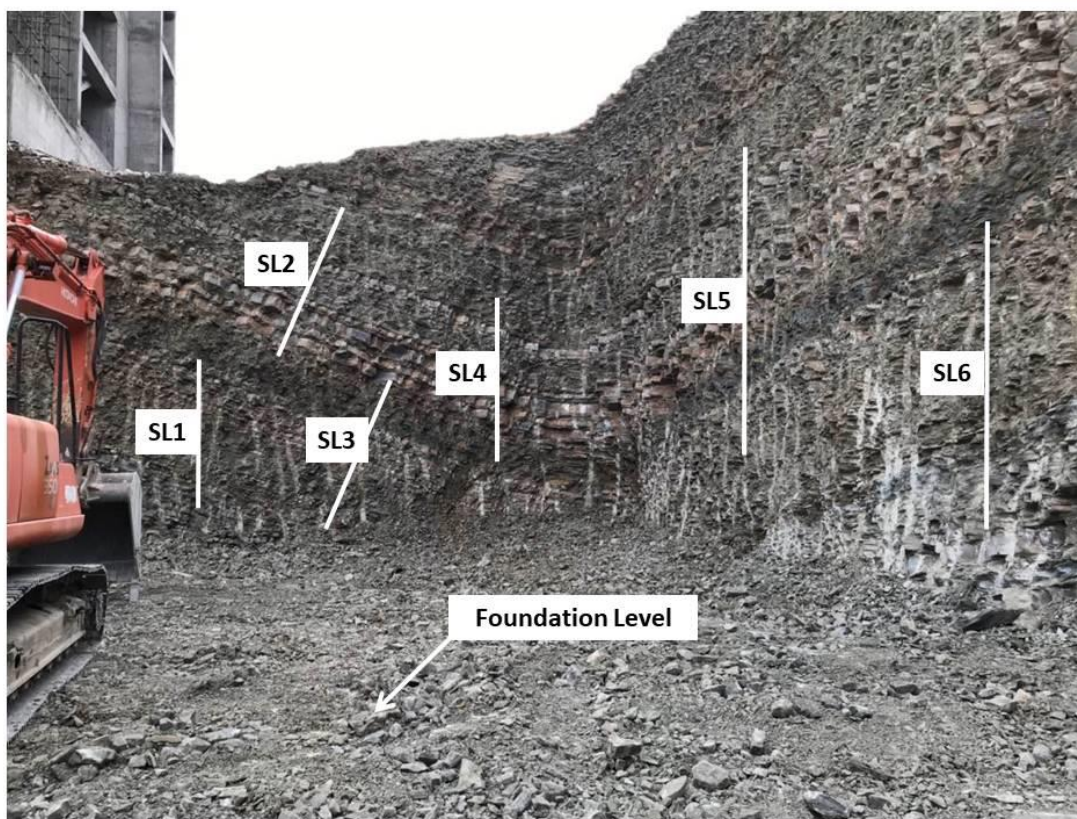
the fabric of the rock mass at foundation of building A10. Note: SL indicates the Scan lines
